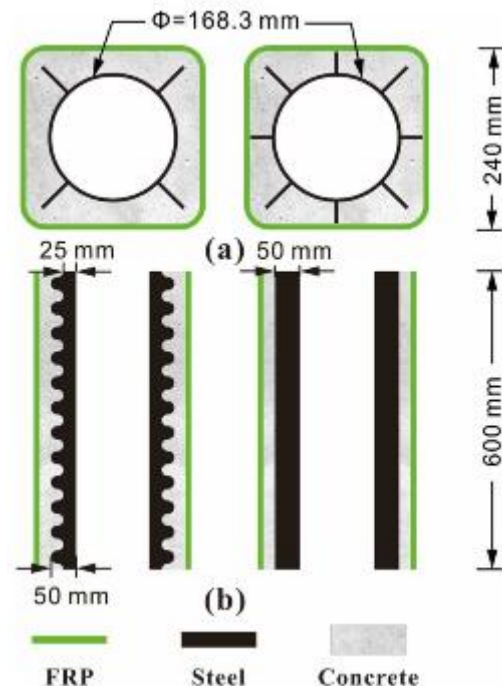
Details of hybrid R-DSTCs: (a) cross sections; (b) vertical sections
